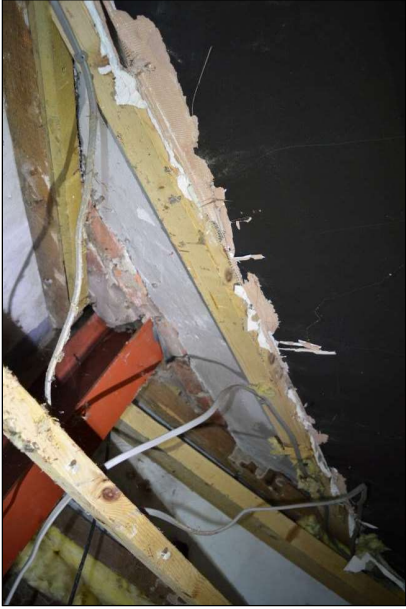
Steel beam set into the south wall of the 19th century house (CPAT 4900-0055)
